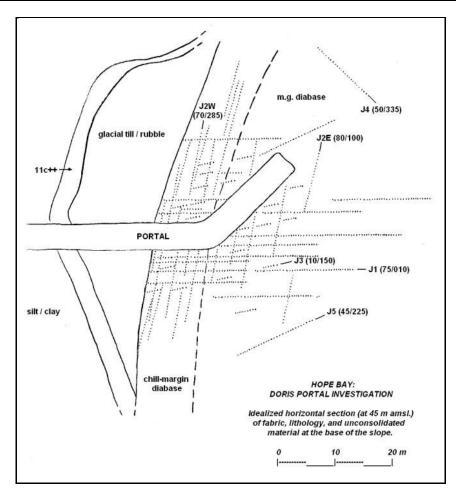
Idealized horizontal section through the base of the portal slope (on the 45 m amsl. contour), illustrating features to be encountered during portal excavation – fabric, intact rock, and unconsolidated material.
